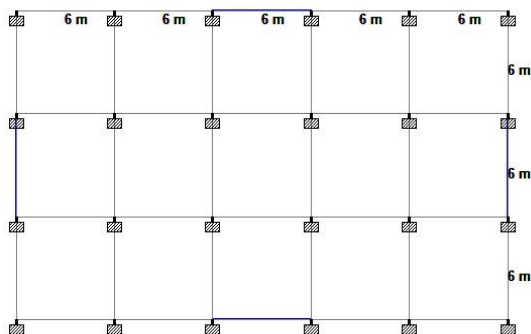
Plan of building frame having Aspect Ratio 0.66 with shear wall (Case Study I)
